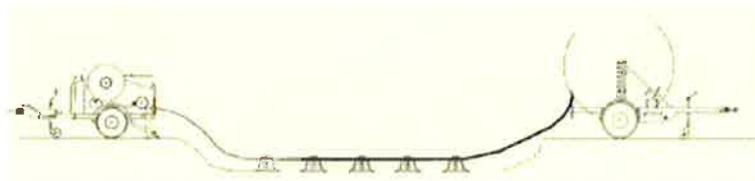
Cable drums and cable pulling. Cable drum on a special trailer (16).
